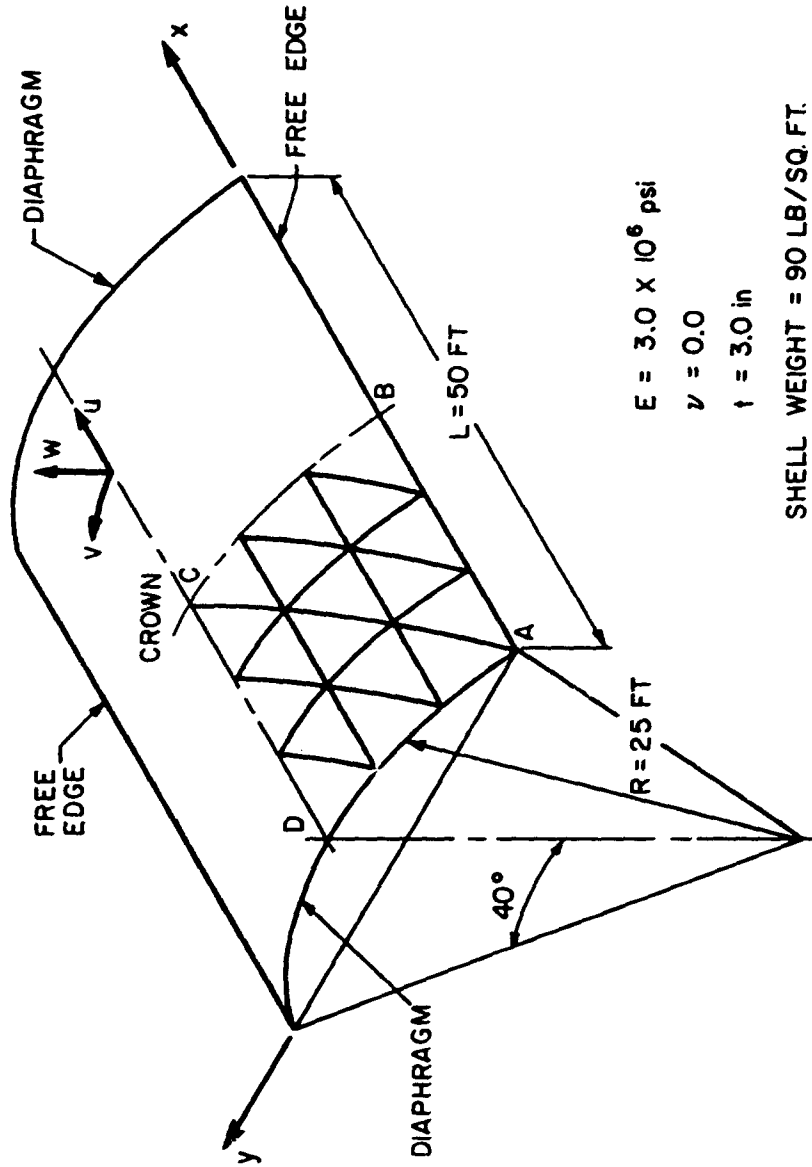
CYLINDRICAL SHELL ROOF CONFIGURATION
